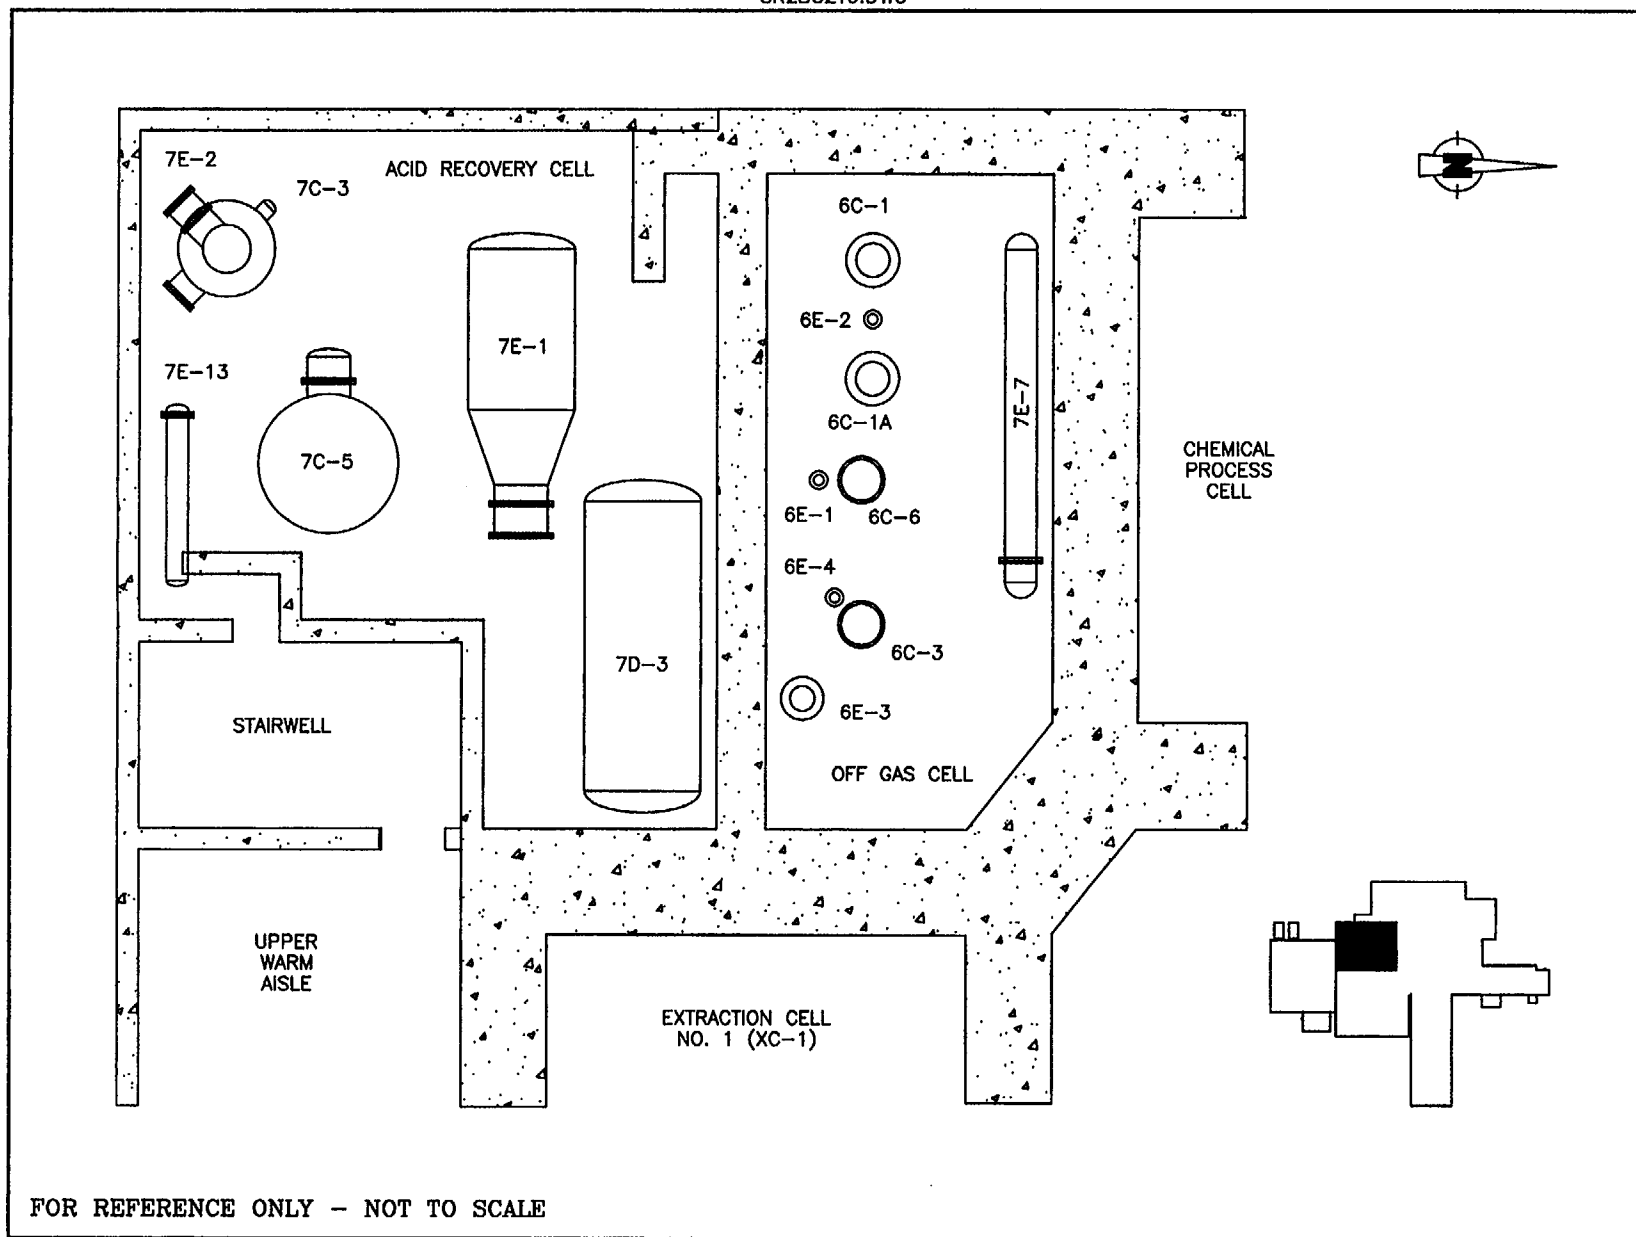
Equipment Arrangement - Off Gas and Acid Recovery Cells - Plan Elevation 111'-6" to 128'-3"
